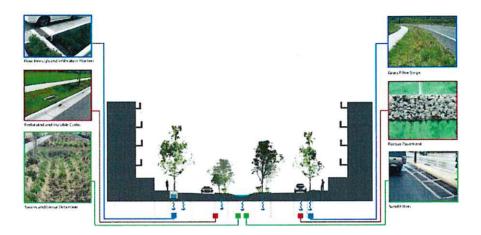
Proposed SUDS Techniques within the Roadway Section
